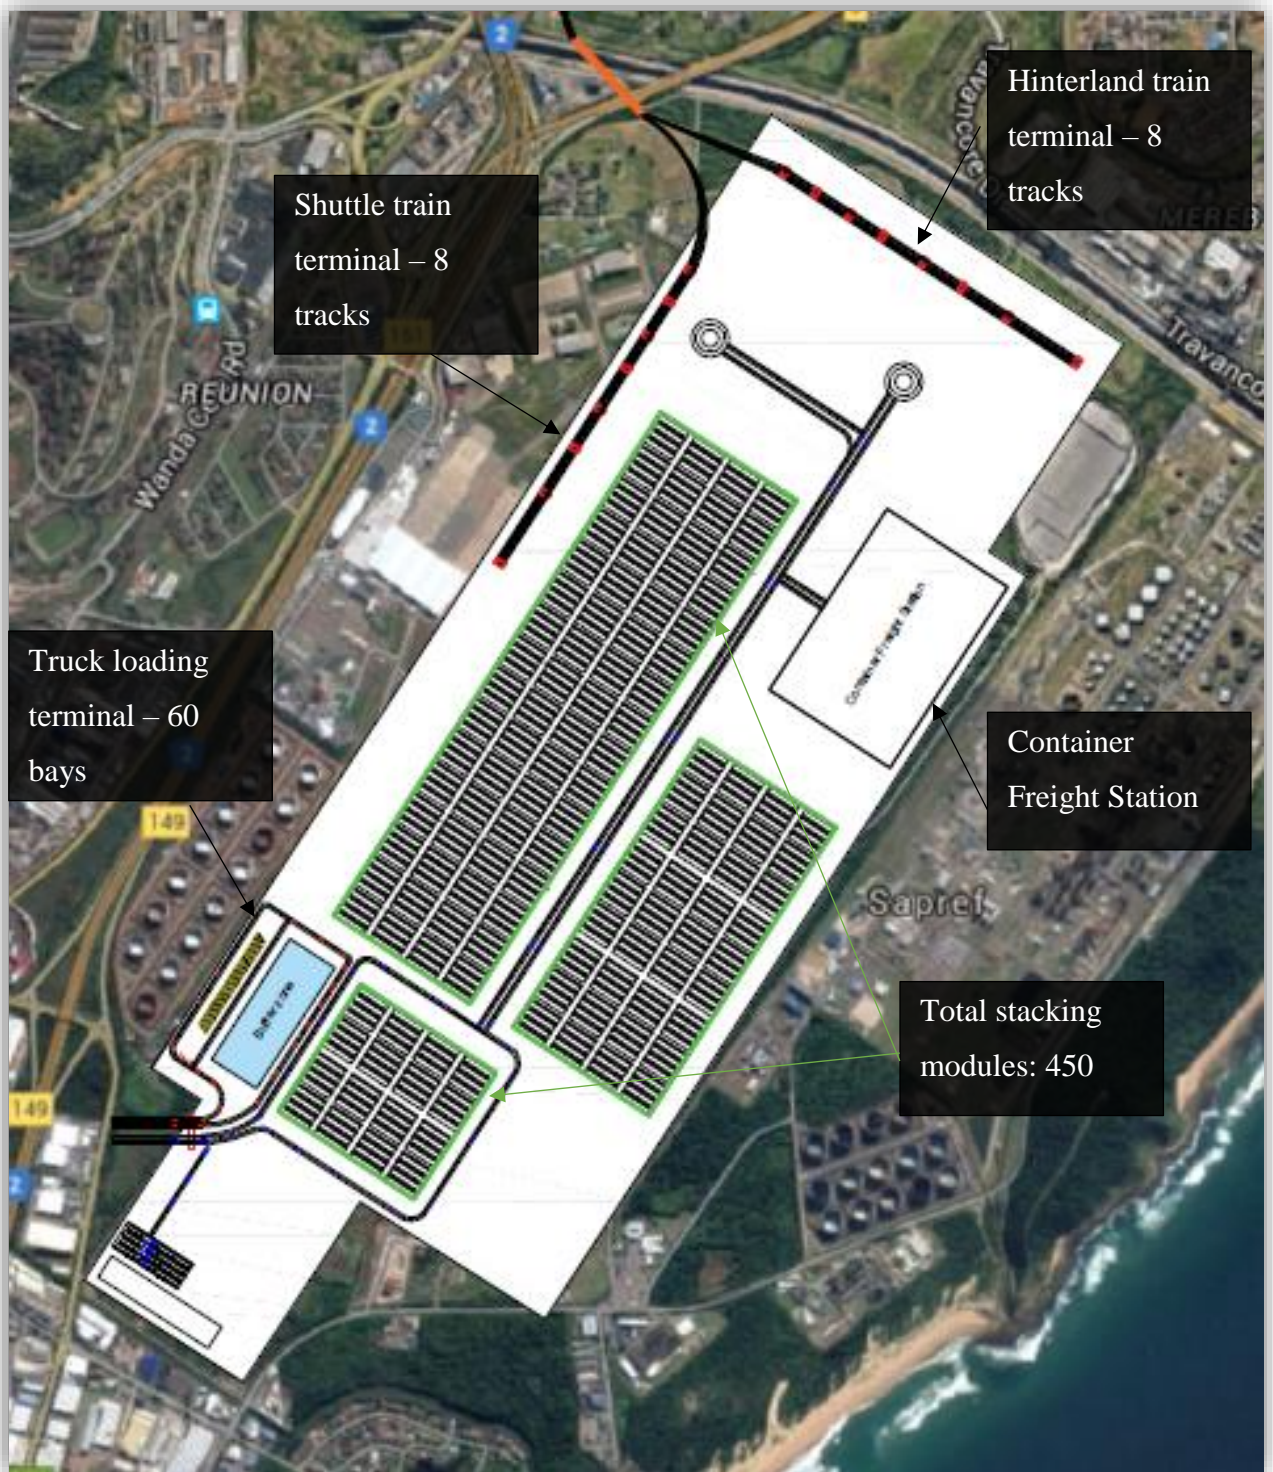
Layout of the proposed dry port, on the old Durban Airport site
